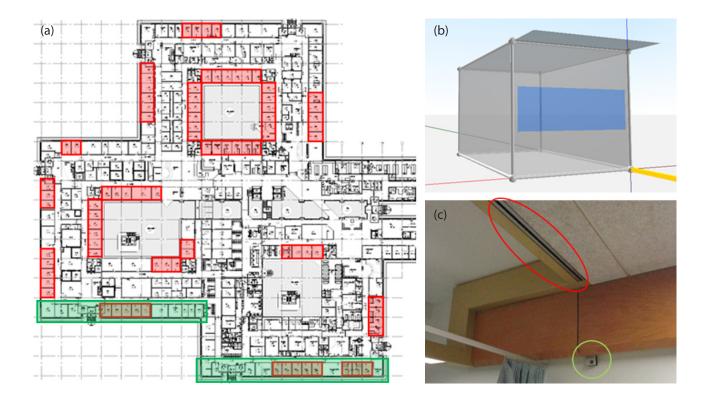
(a) Plan of policlinic building with highlighting of modelled space (red) and western façades (green). (b) VABI Elements[©] model. (c) Local re-heating system: air inlet (red) and temperature set-point control (green).
